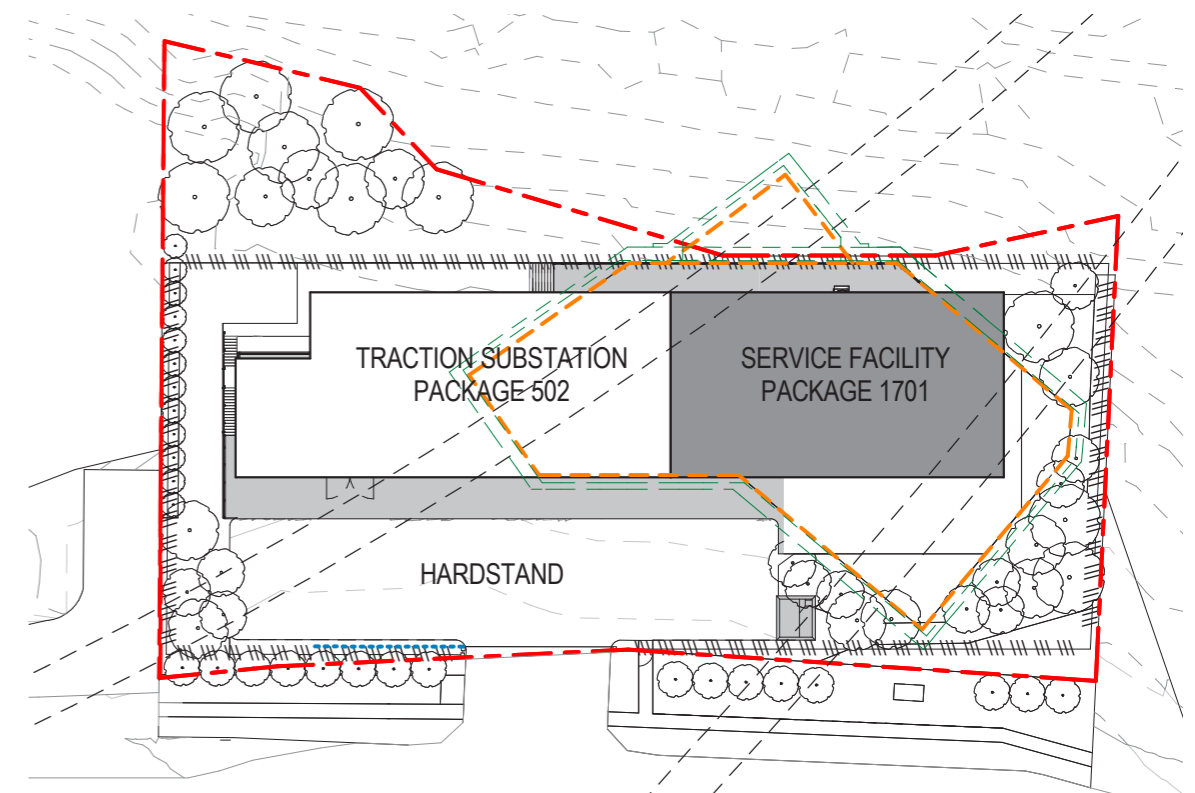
ESF_Epping Services Facility Plan. Source: HASSELL.
